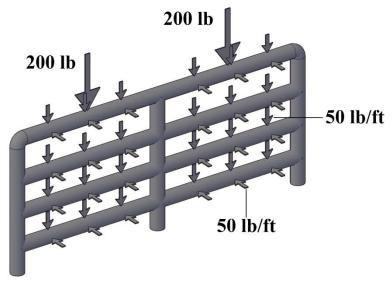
AASHTO Loading Criteria (Vertical 200-lb Point Load Shown)
